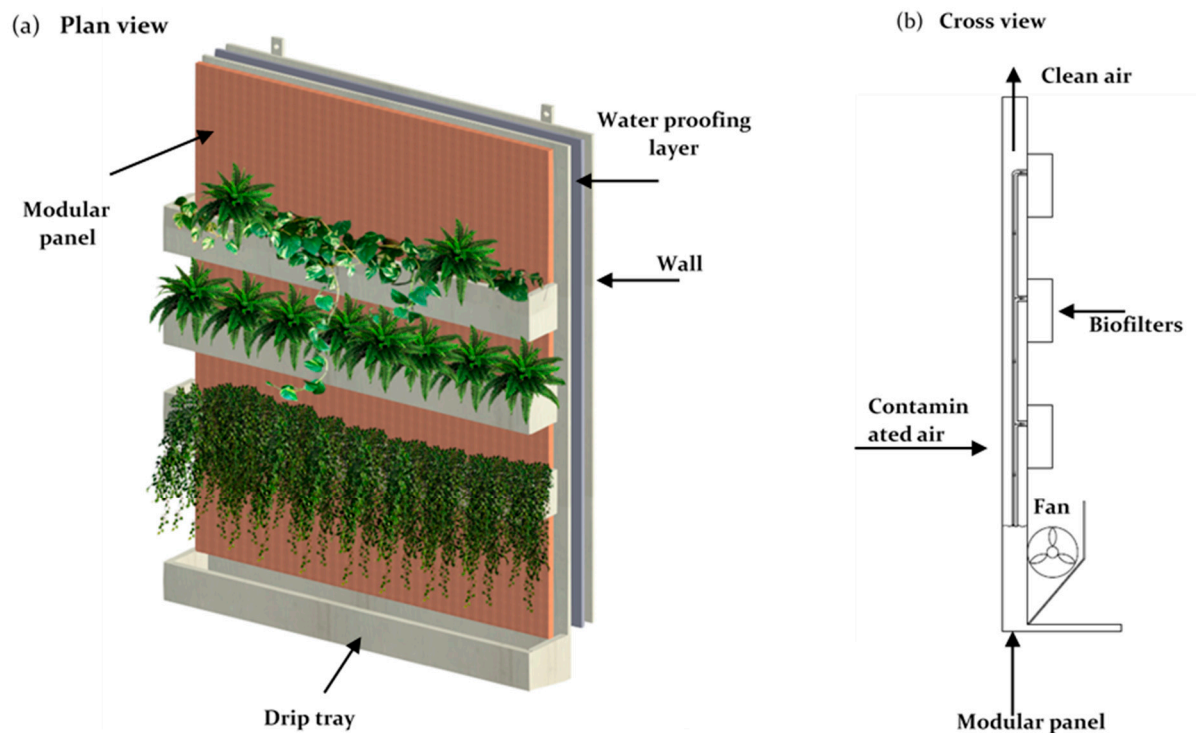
Prefabricated green wall: (a) plan view and (b) sectional view.
